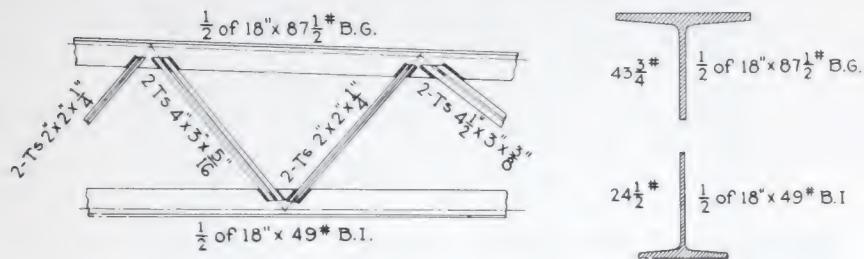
Typical Arc-welded Warren-type Truss
